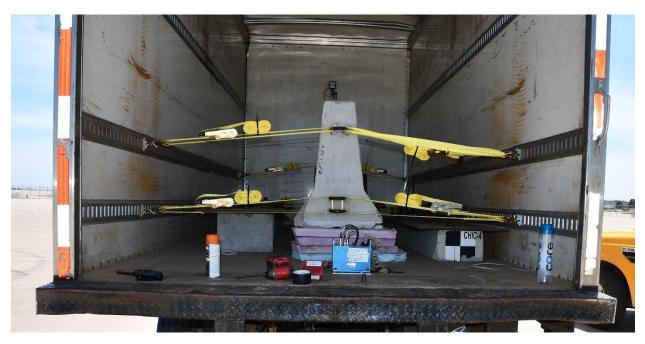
Nylon Straps and Ballast Installation, Test No. STBR-4
